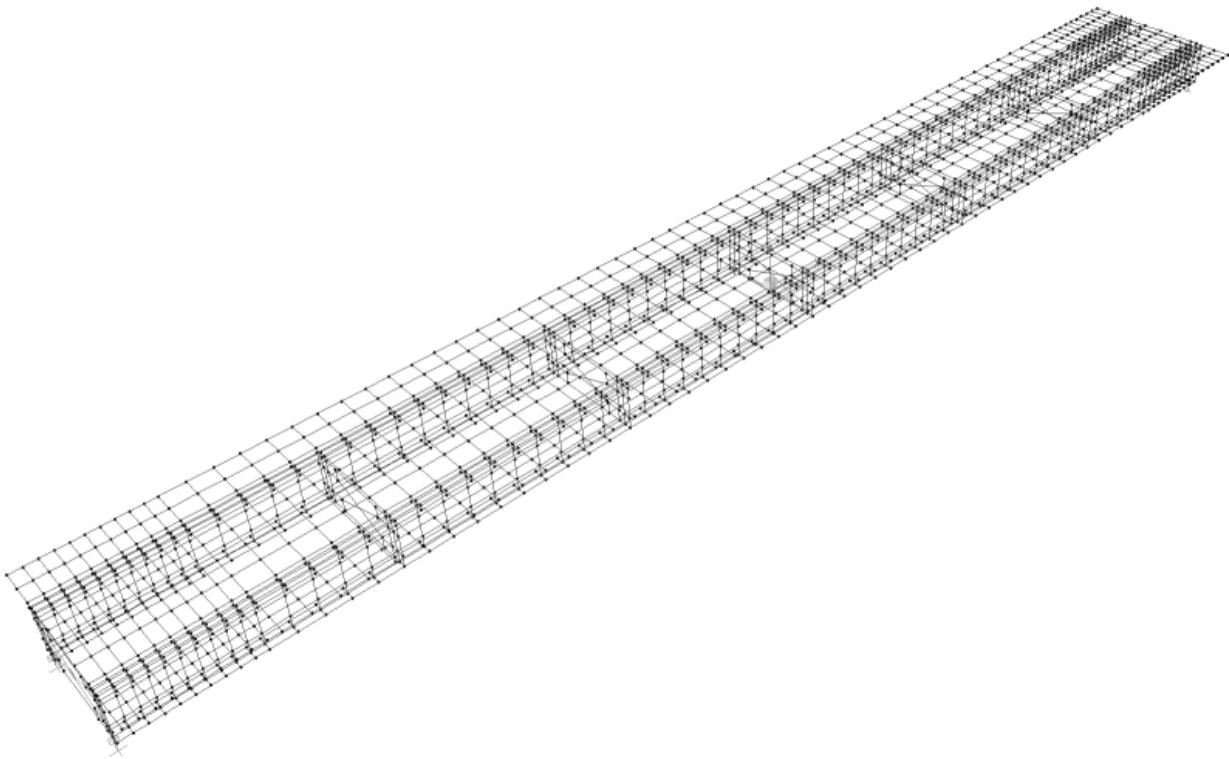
2/5 Scale bridge model - general transverse bracing.
